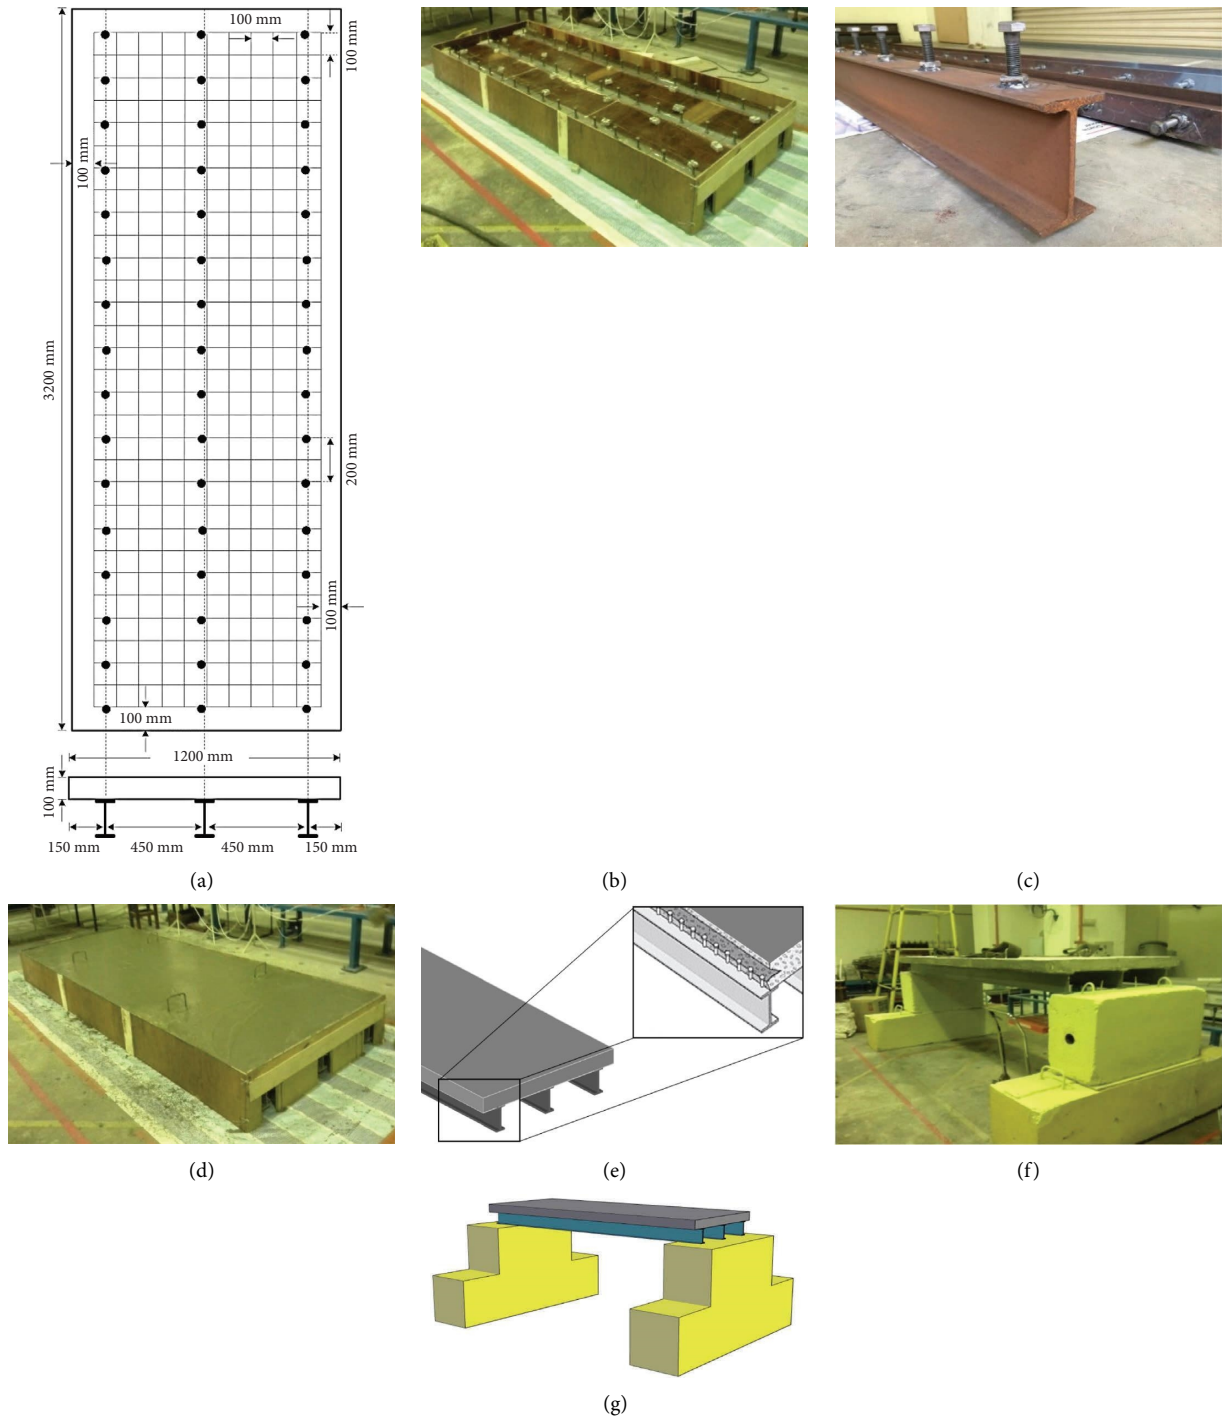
(a) Layout plan and dimensions, (b) construction of the specimen, (c) shear stud connectors, (d) casted model, (e) schematic view, (f) laboratory test setup, and (g) schematic setup of the specimen.
